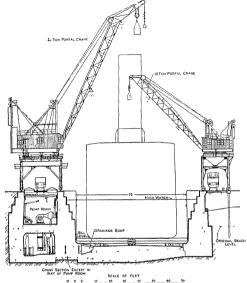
CROSS SECTION THROUGH PUMP ROOM OF DRY DOCK AT THE KING S DOCK SWANSEA WALES from hoists to the hatchways of large modern vessels, hydraulic
